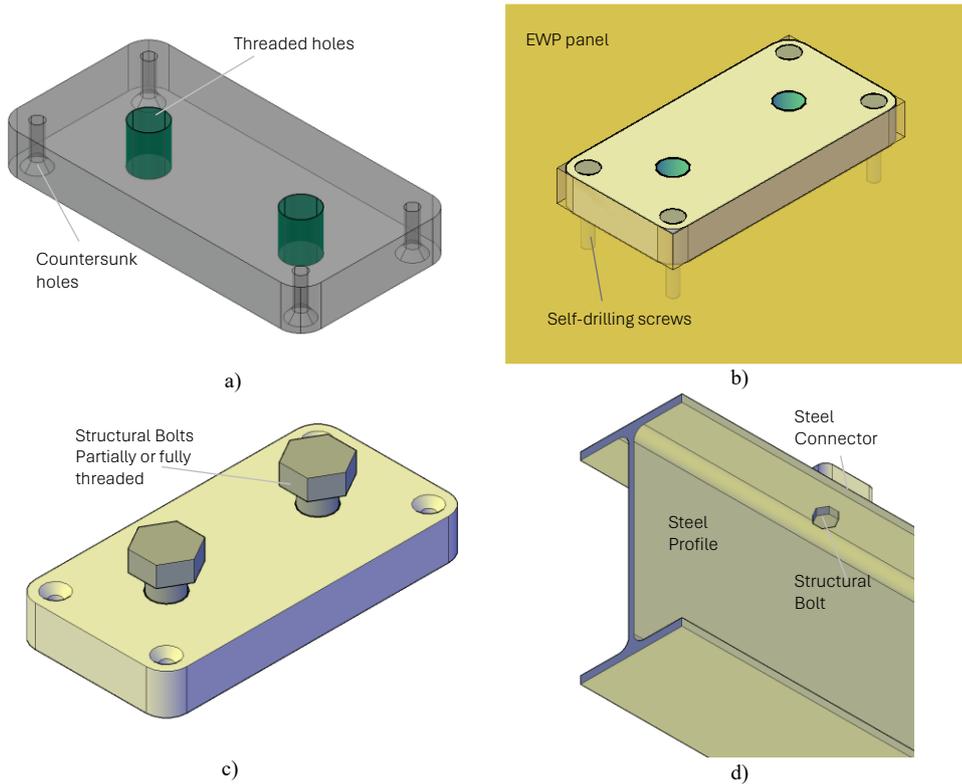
a) Steel connector; b) Connection between steel connector and EWP panel; c) Detail of bolt-connector connection; d) Connection between steel connector and steel profile (*Patent application pending*)
